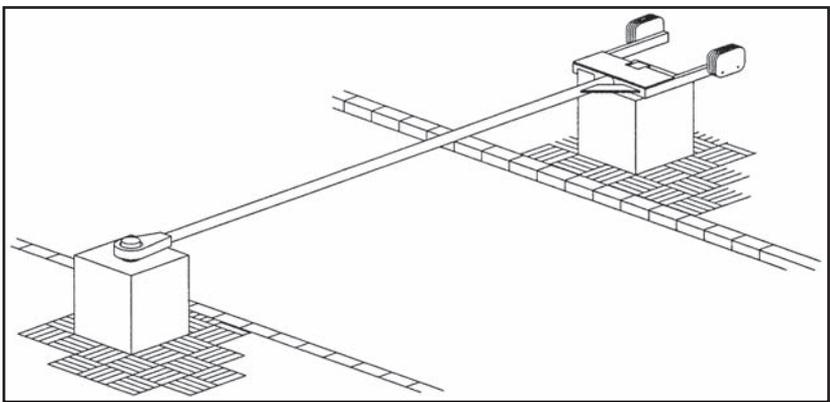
Typical Cable Reinforced Crash Beam Barrier (UFC 4-022-02)
